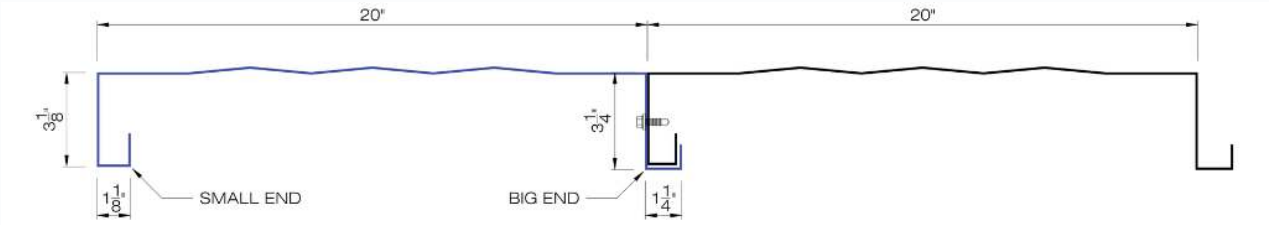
DETAIL · FASTENED INTERLOCK JOINT
